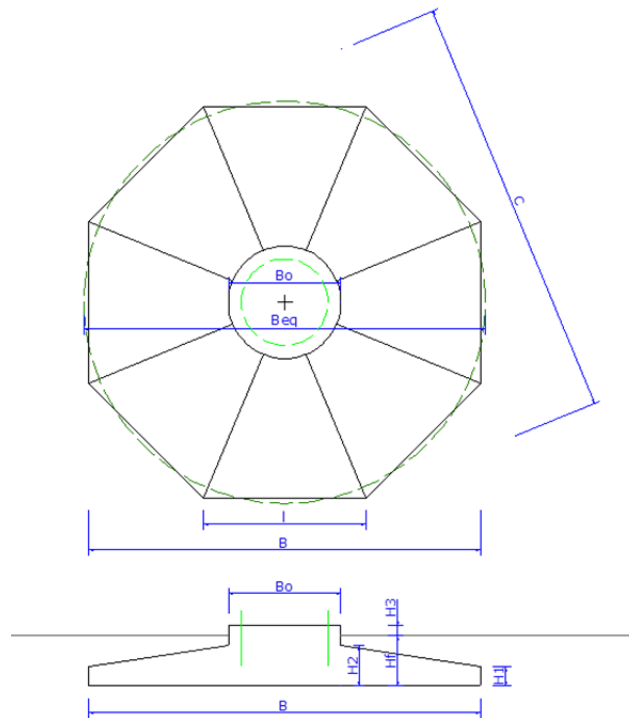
Foundation steel ring embedded in the foundation concrete slab
